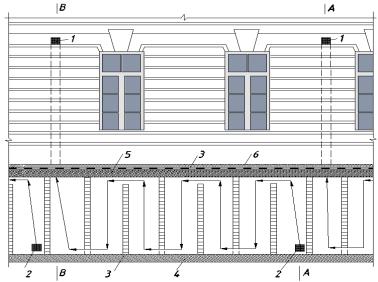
Figure 6 - Longitudinal section of the ventilation duct
